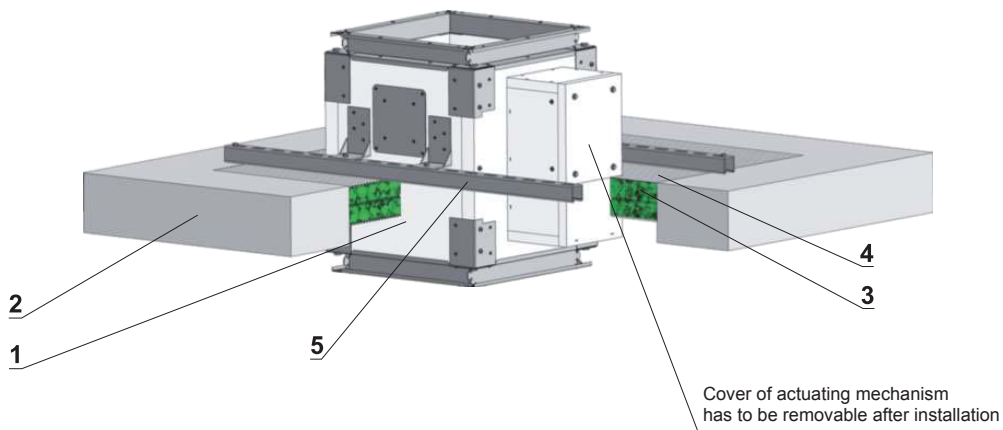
Example of installation in solid ceiling construction of fire compartment - actuating mechanism below
